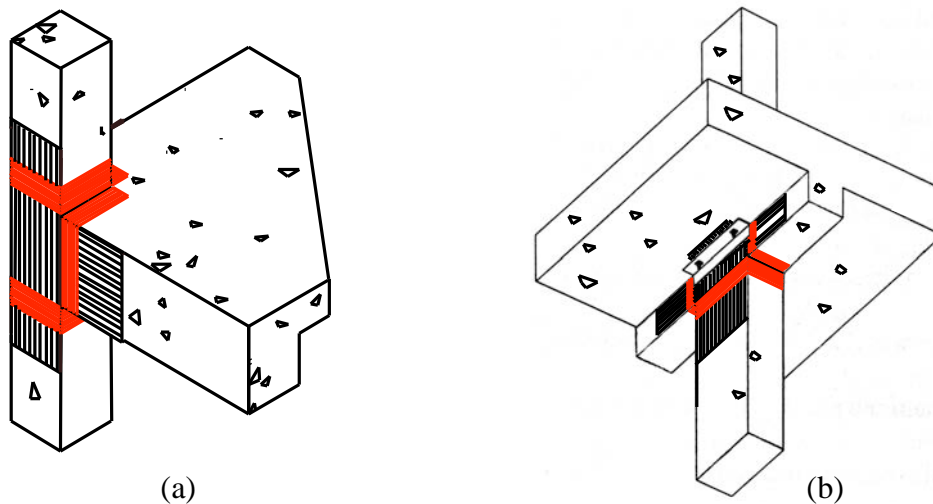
Typical composite material configurations for beam-column joint strengthening. (a) exterior joint, (b) interior joint.
